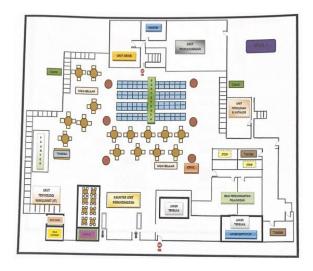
(a) Tengku Anis Library Floor Plan Level 1
